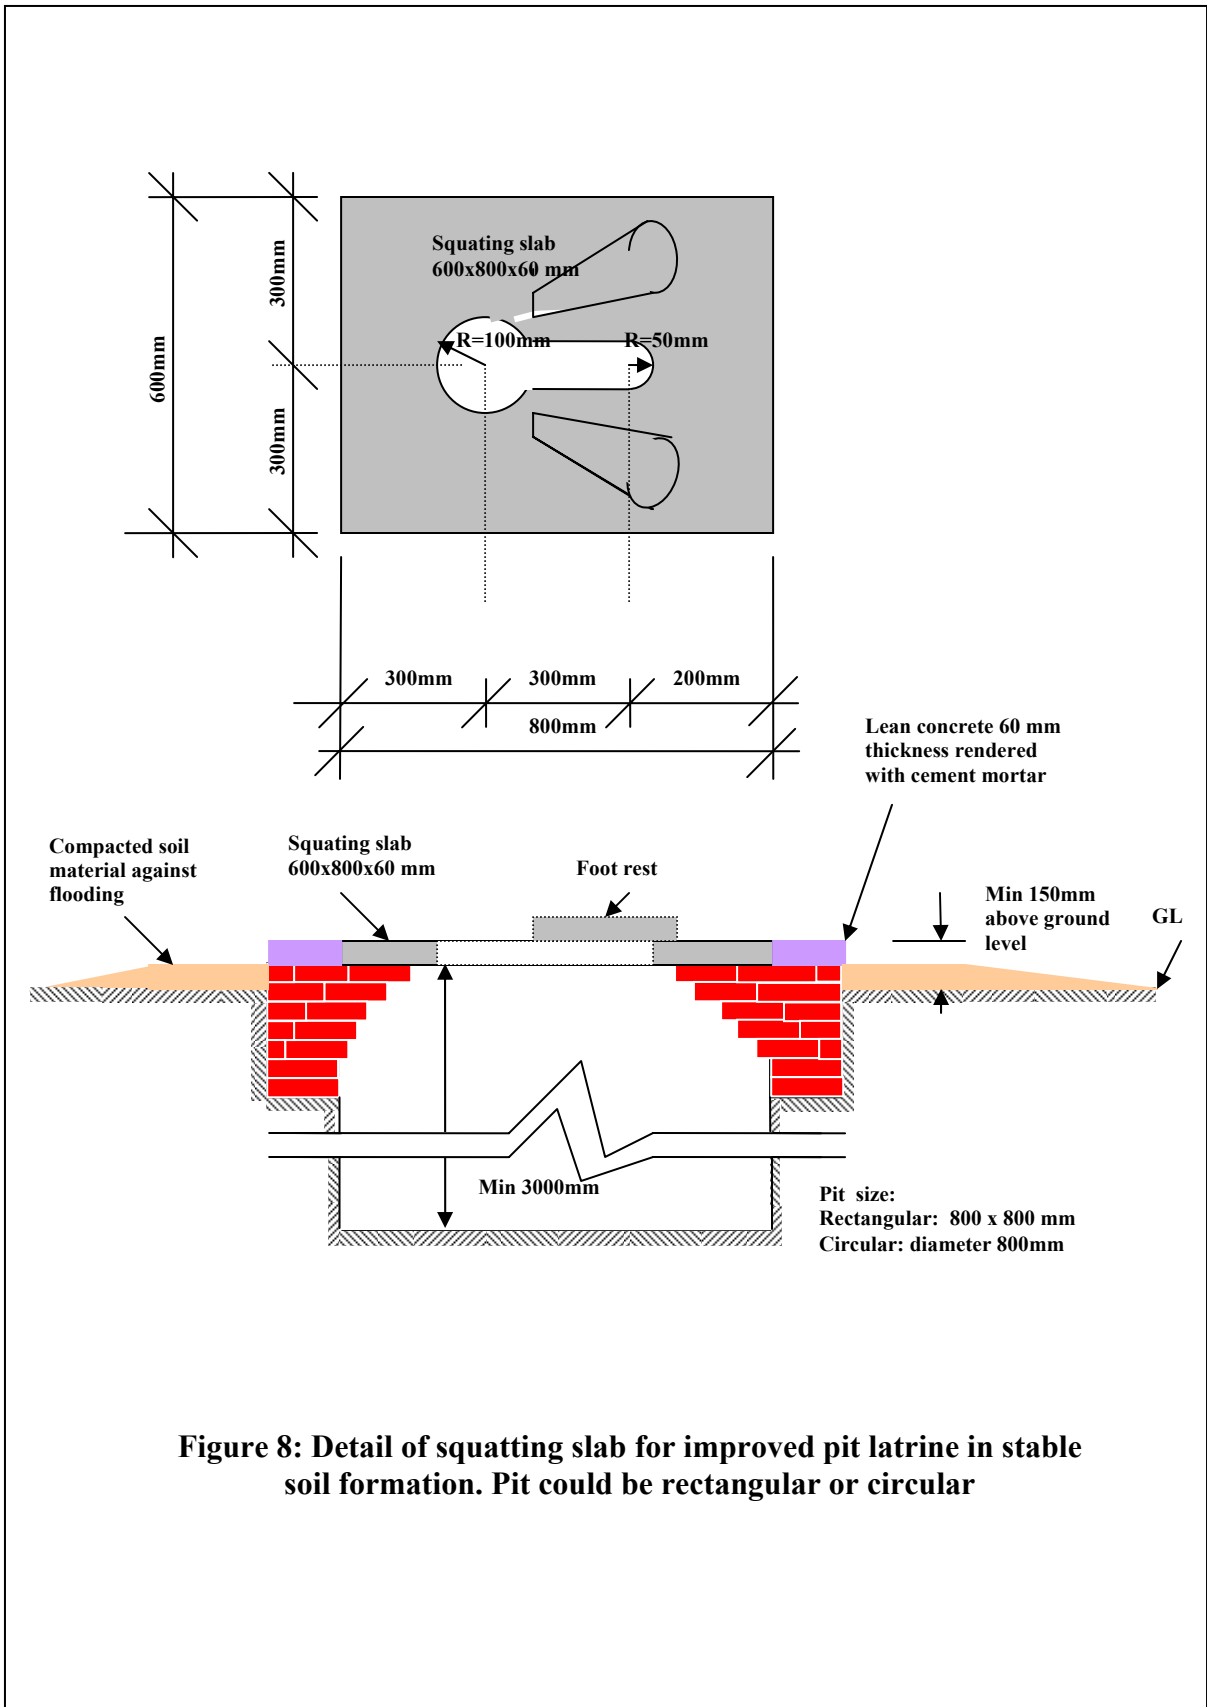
Detail of squatting slab for improved pit latrine in stable soil formation. Pit could be rectangular or circular
